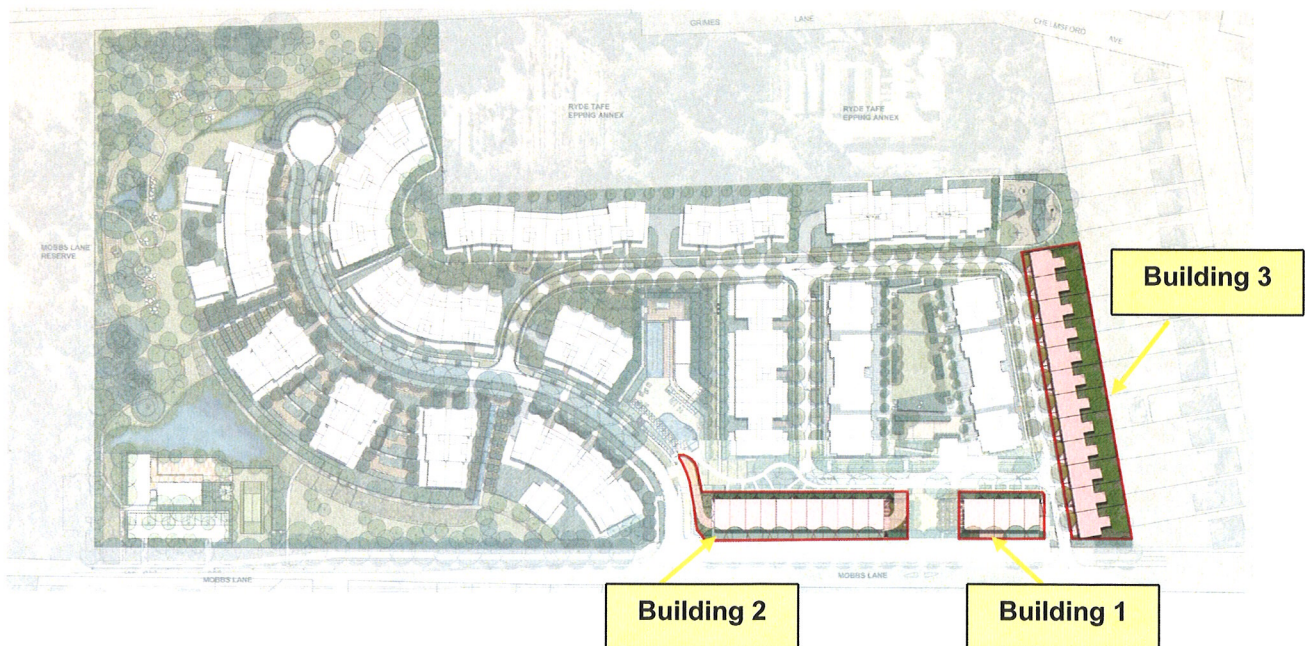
Approved layout for Buildings 1, 2 and 3, MP10_0107.
